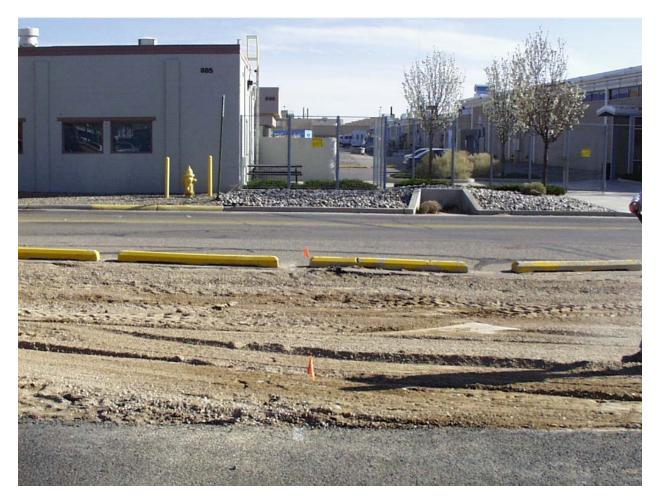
Two orange pinflags mark the location of the DSS Site 1101, Building 885 septic system, drain line running north from Building 885 (upper left of photo) and beneath "H" Street. View to the south. March 26, 2002
